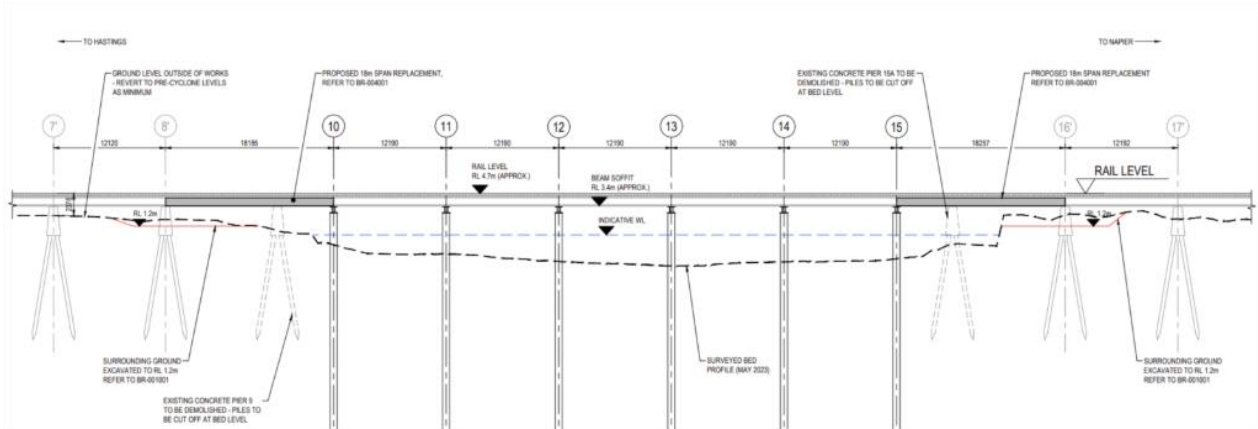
Proposed construction methodology for Span Replacement and Pier Removal at Bridge 217.
